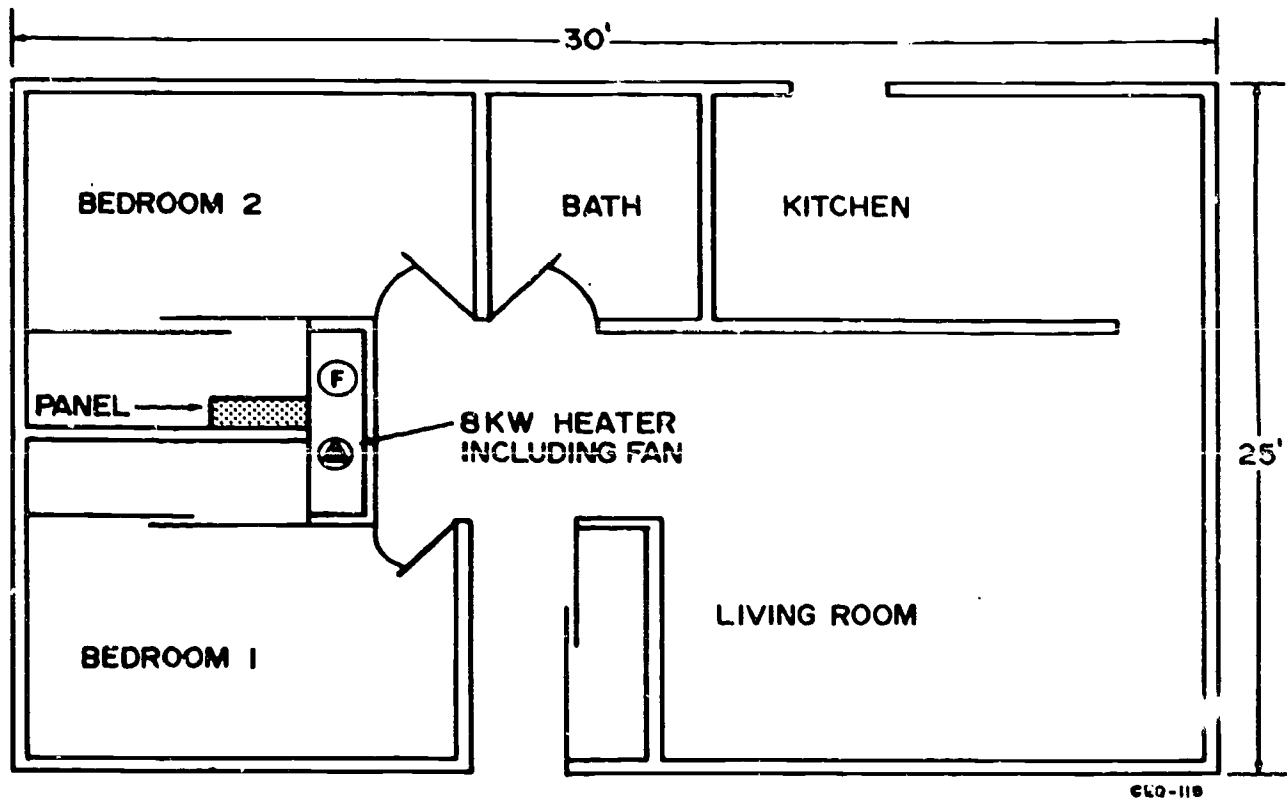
Floor plan (objective 246, exercise 1-7).
